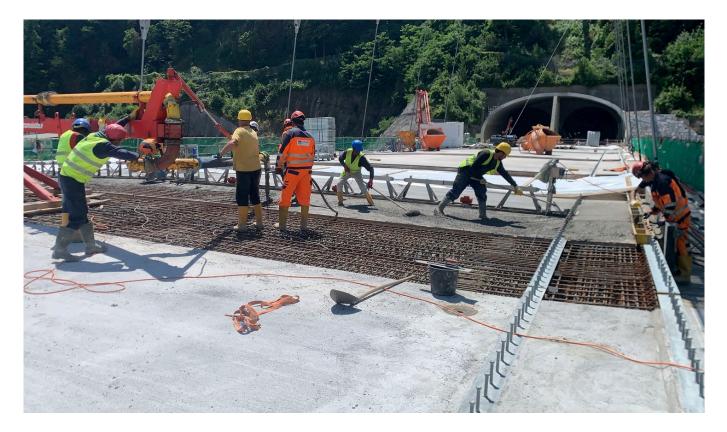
In-situ concreting of deck slab / schlaich bergermann partner
